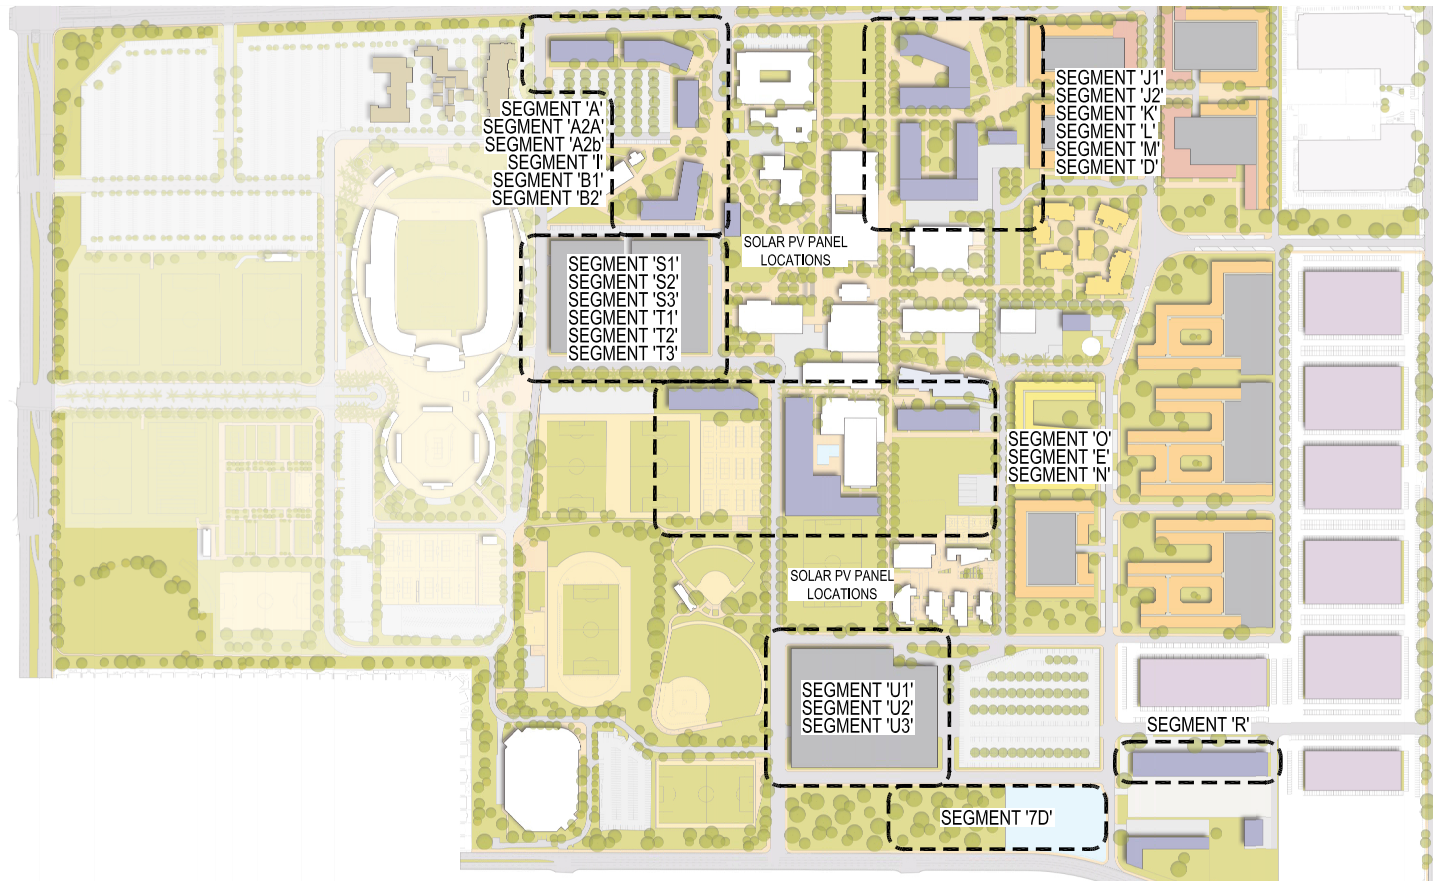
PRELIMINARY LAYOUT FOR PHOTOVOLTAIC SYSTEMS ON NEW BUILDINGS, PARKING STRUCTURES, AND LAND PARCEL.
